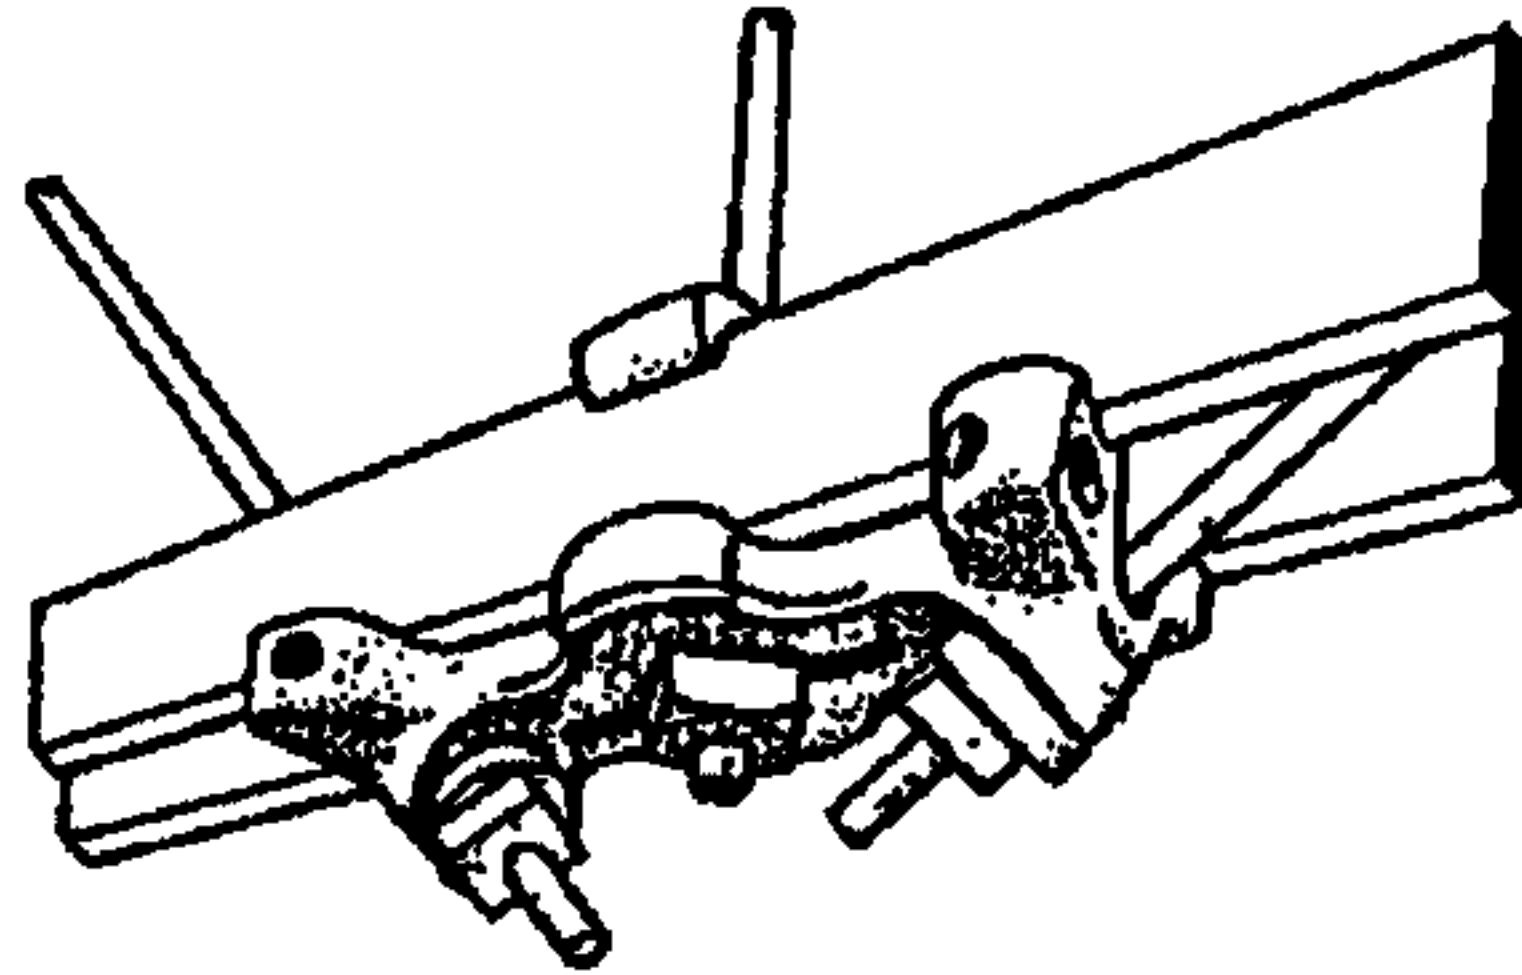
Diagonal connection detail from Fort Laramie Bridge. Delineated by Chris Payne in HAER No. WY-1, "North Platte River Bowstring Truss Bridge," 1993.
